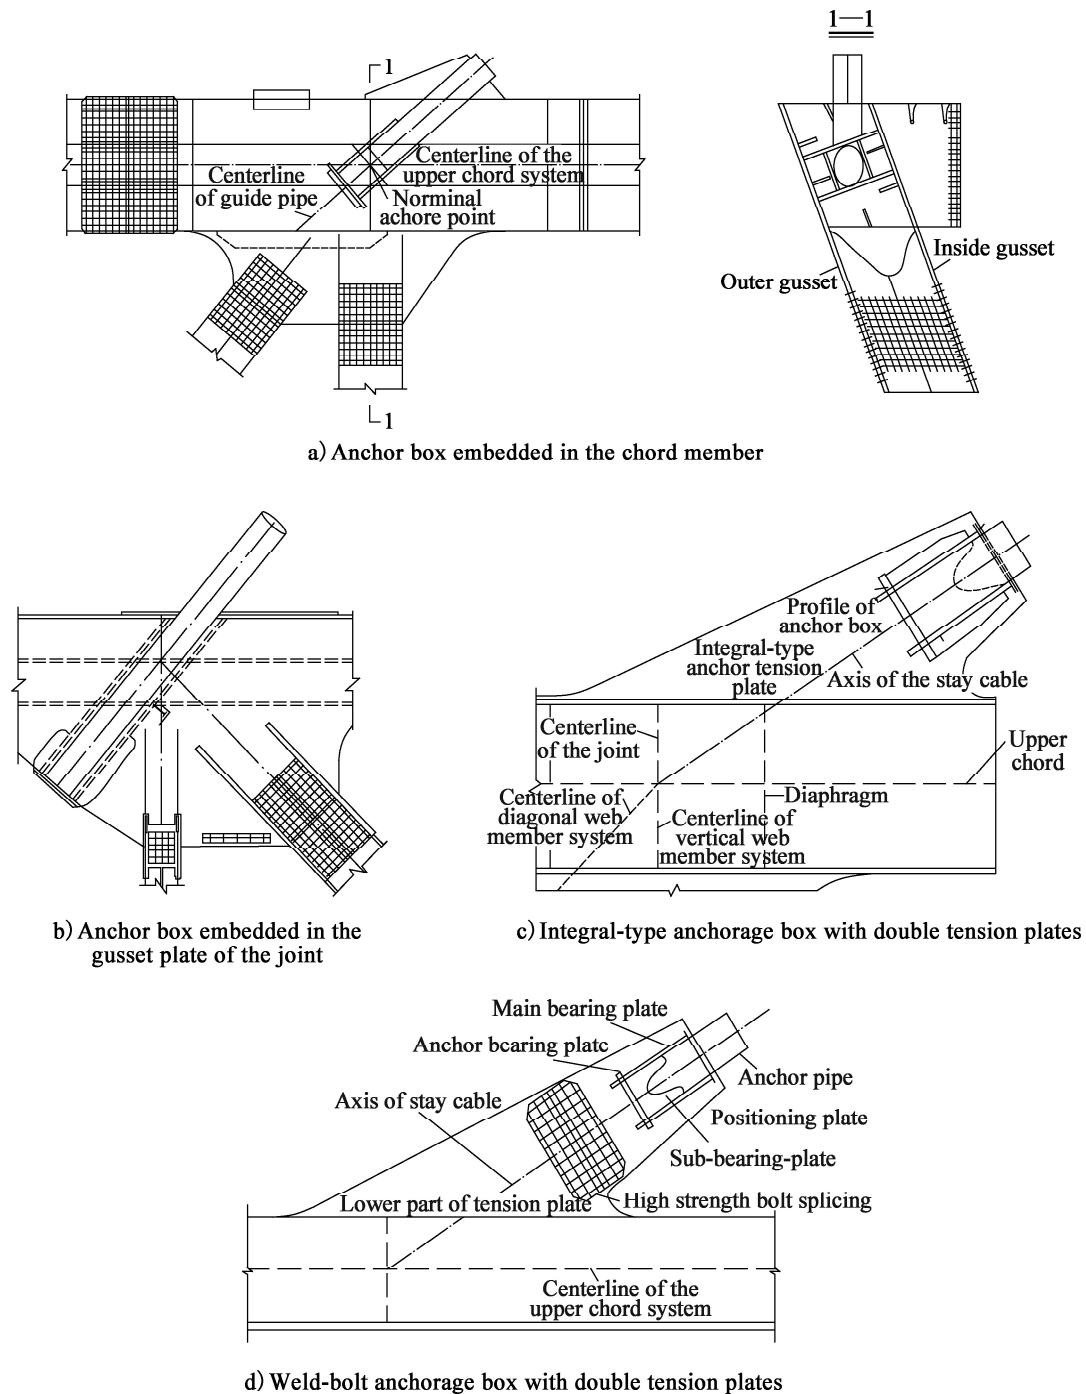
6. 4 Anchorage for stay cable anchored on steel truss
